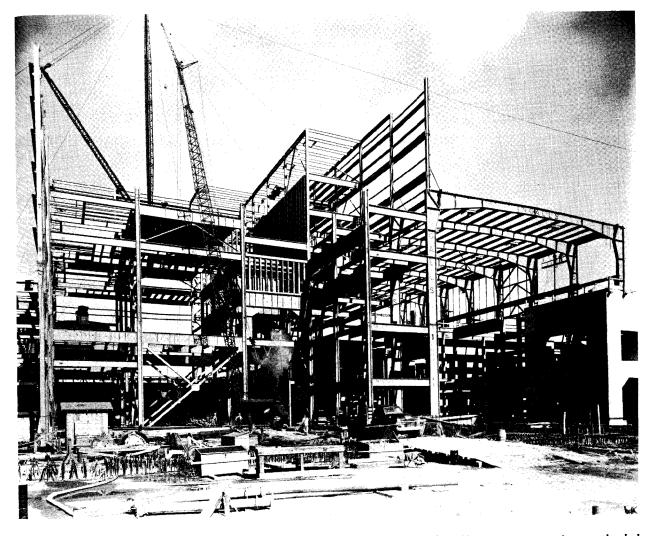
Structural steel framing was temporarily pinned and bolted in half the holes. After temporary erection was plumbed and braced, remaining holes were riveted, then bolts and pins were replaced with rivets.
